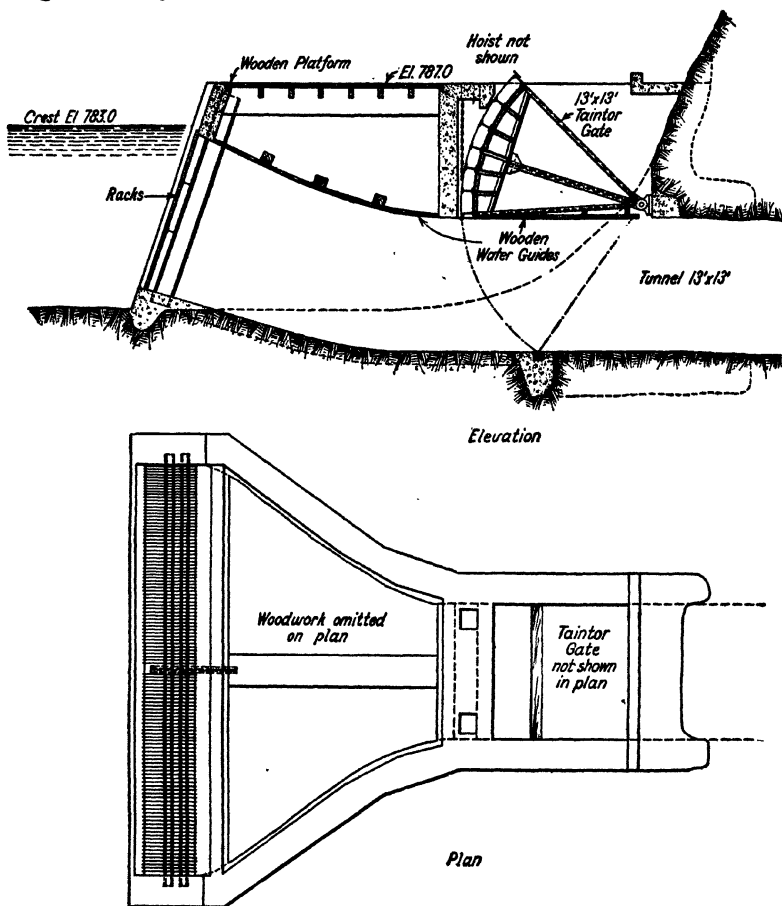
Great Falls Tunnel, Intake, Tennessee Power Co.
